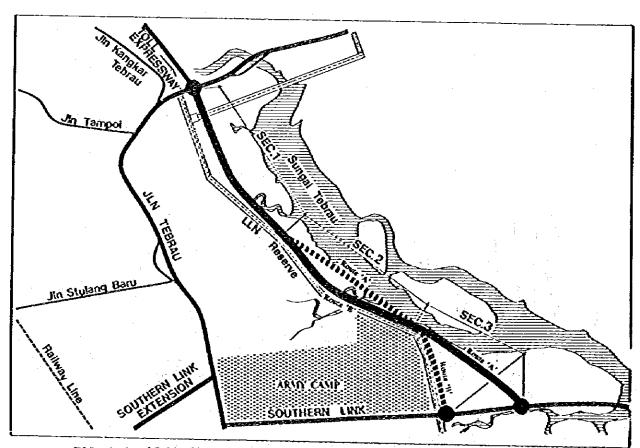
ALTERNATIVE ROUTES OF TOLL EXPRESSWAY ACCESS ROAD
